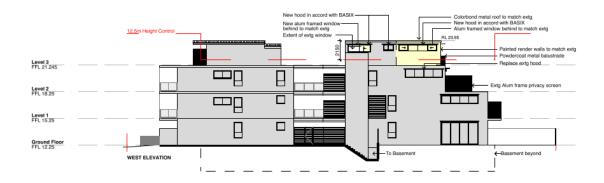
North-west elevation showing the proposed addition in yellow (Source: Ken Powell Architects)
